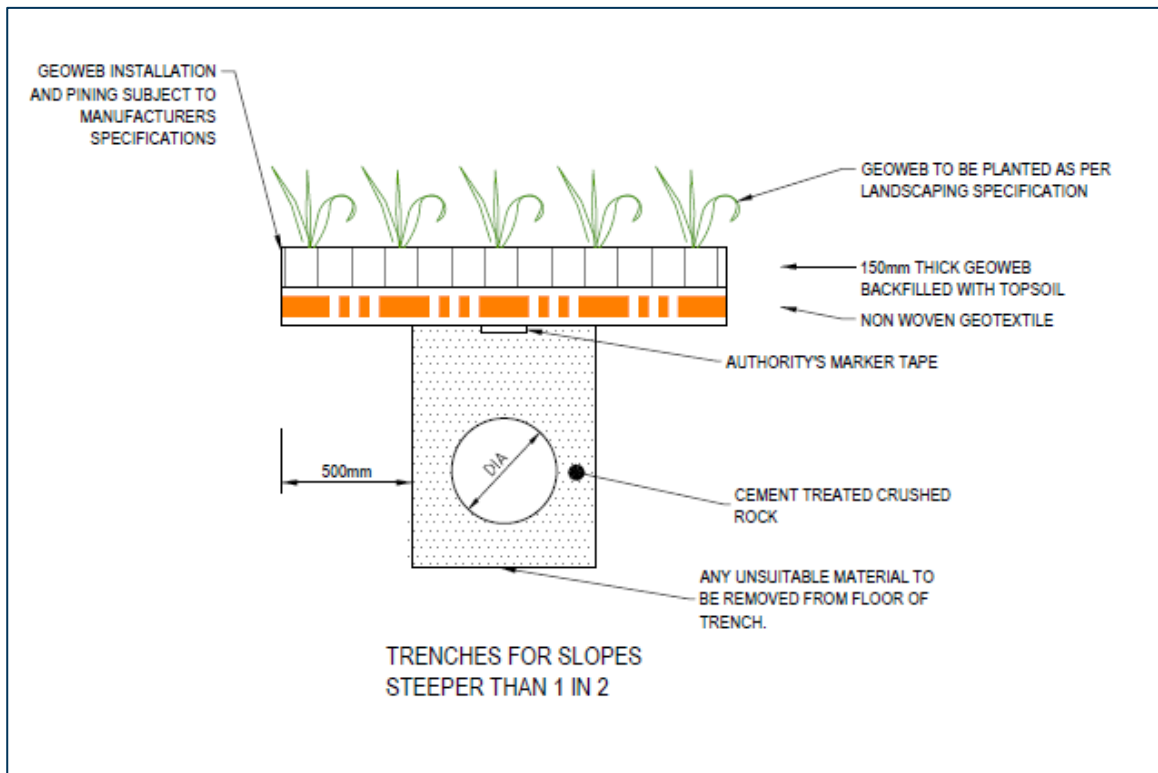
Pipe Trenching Detail for Slopes Steeper than 1 in 2
